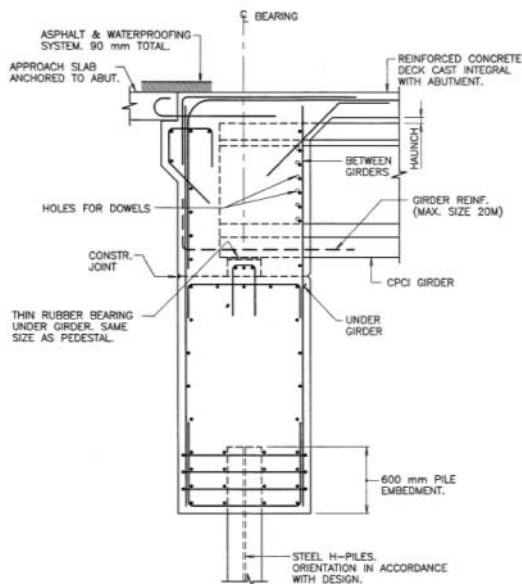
Typical integral abutment detailing in Ontario (Husain & Bagnariol 1996)
